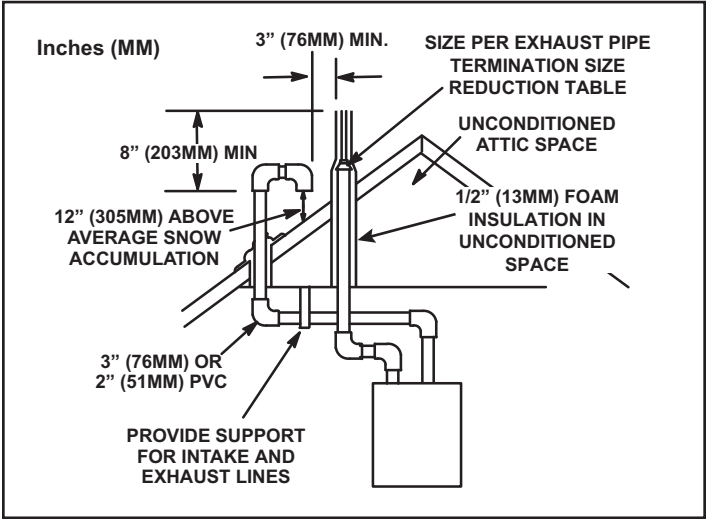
Direct Vent Roof Termination (15F75 or 44J41)
